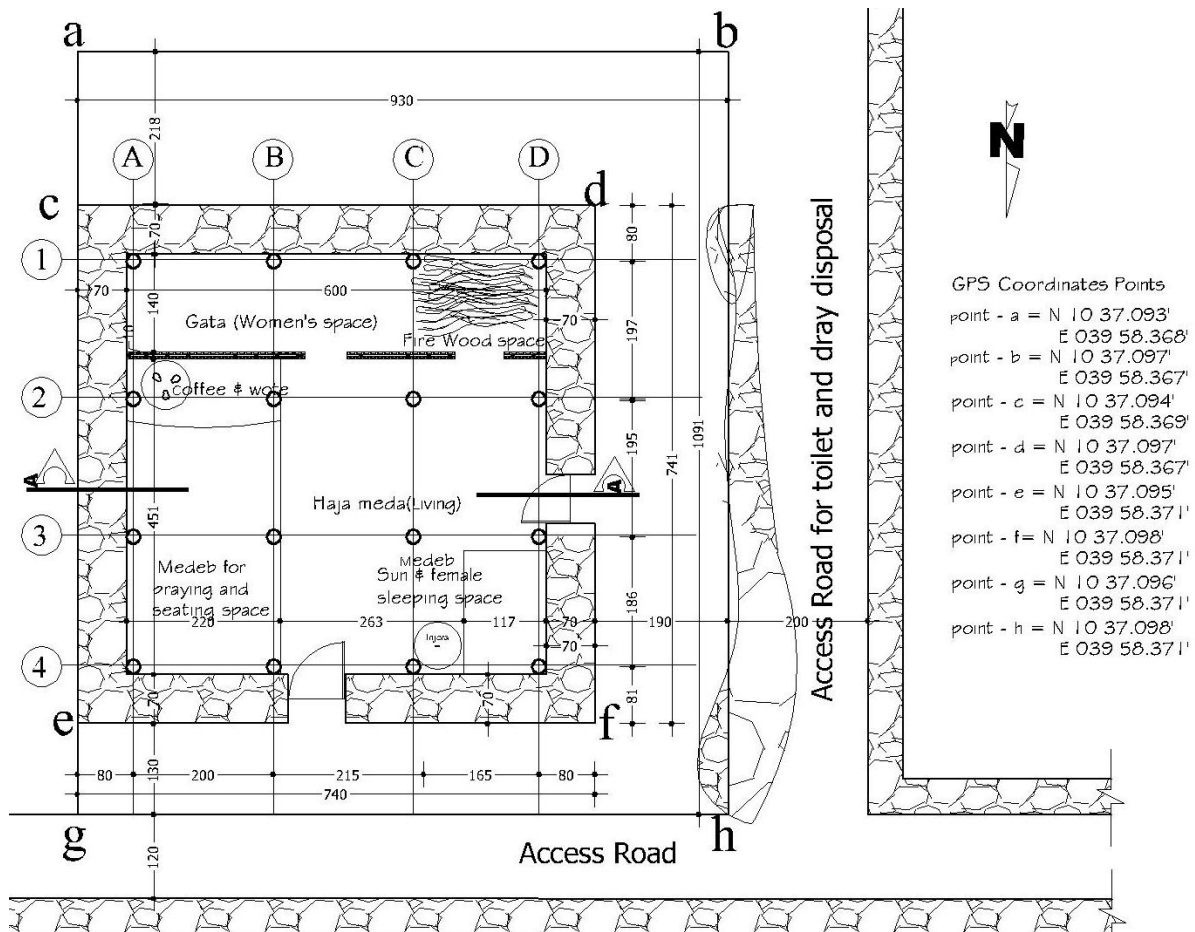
177 Compound and Floor plan of Ato Endris Yasin Weliyu's house
